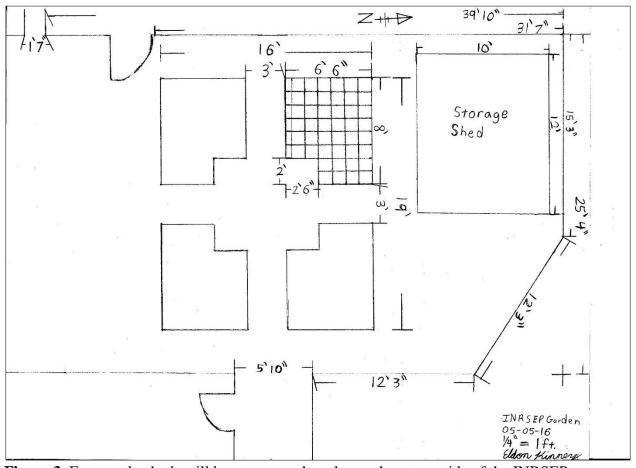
Four garden beds will be constructed on the north-eastern side of the INRSEP backyard utilizing locally outsourced wood. The soil will be built over time and amended with soil from Royal Gold donations.
